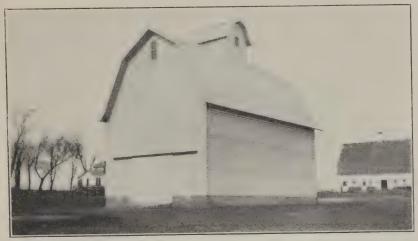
A separate unit in the farmstead group, exposed to prevailing winds and at ample distance from other buildings to minimize fire hazard. Note also high foundation and good drainage.
